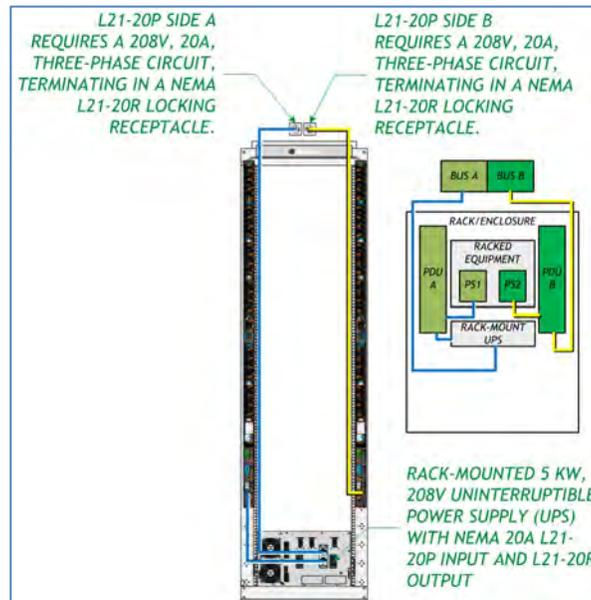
TR Single Rack Elevation and Power Schematic (OIT Design Guide Template, V3.1)
